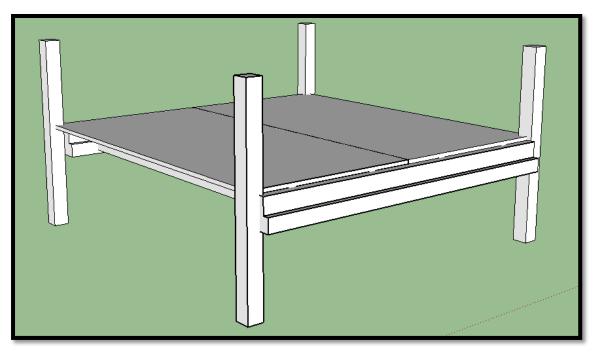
Isometric View Alternative Prestressed Concrete Bay Design
